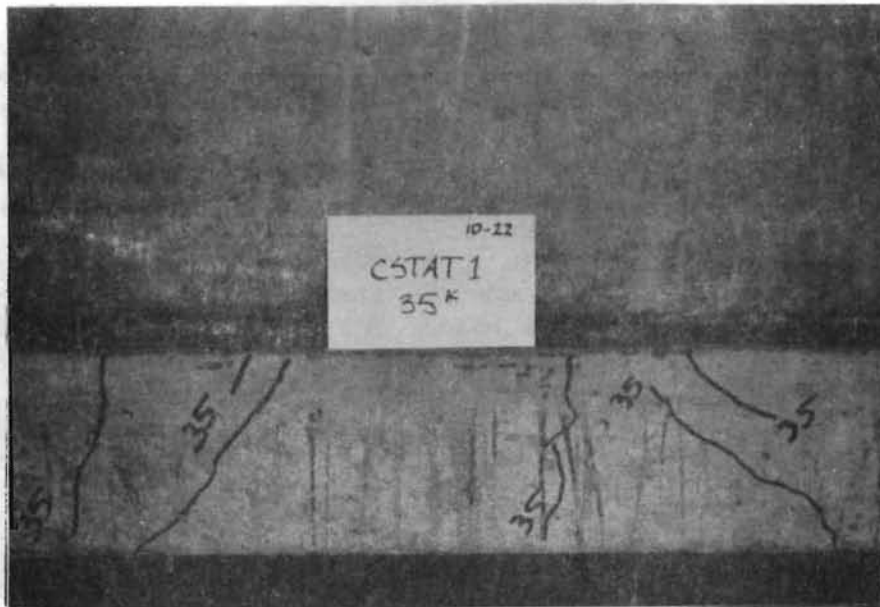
Initial inclined slab cracking: CSTAT1
